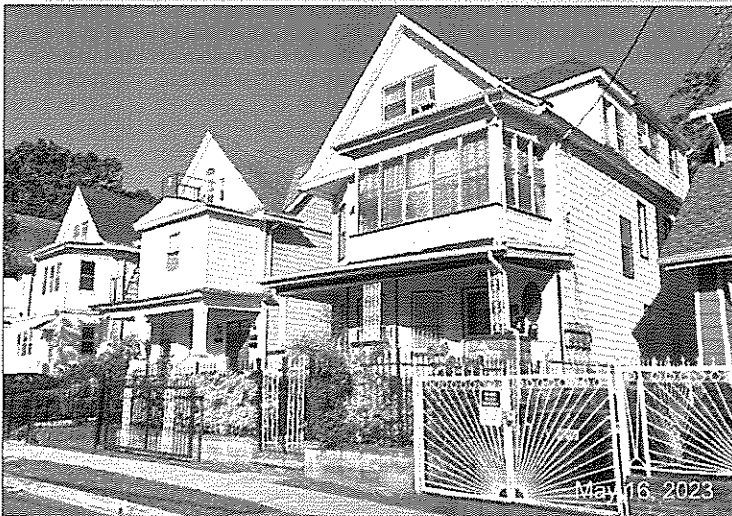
View of the subject property located at 220 North Center Street. The applicant proposes to renovate and convert this one-family dwelling to a two-family dwelling.
